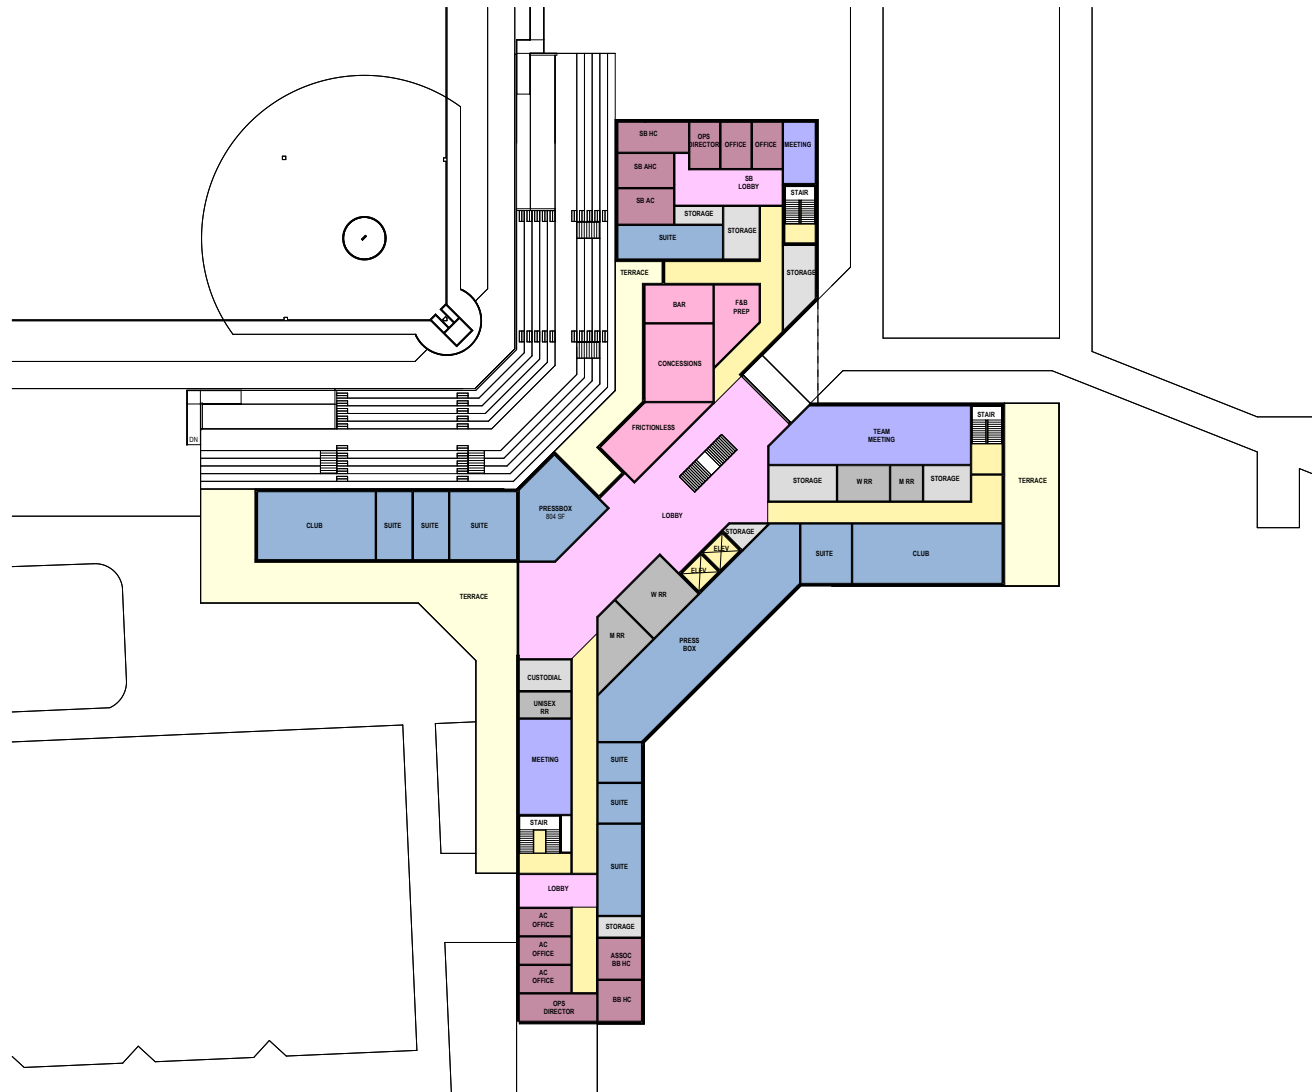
South Campus Operations Building Level 1 Floor Plan
